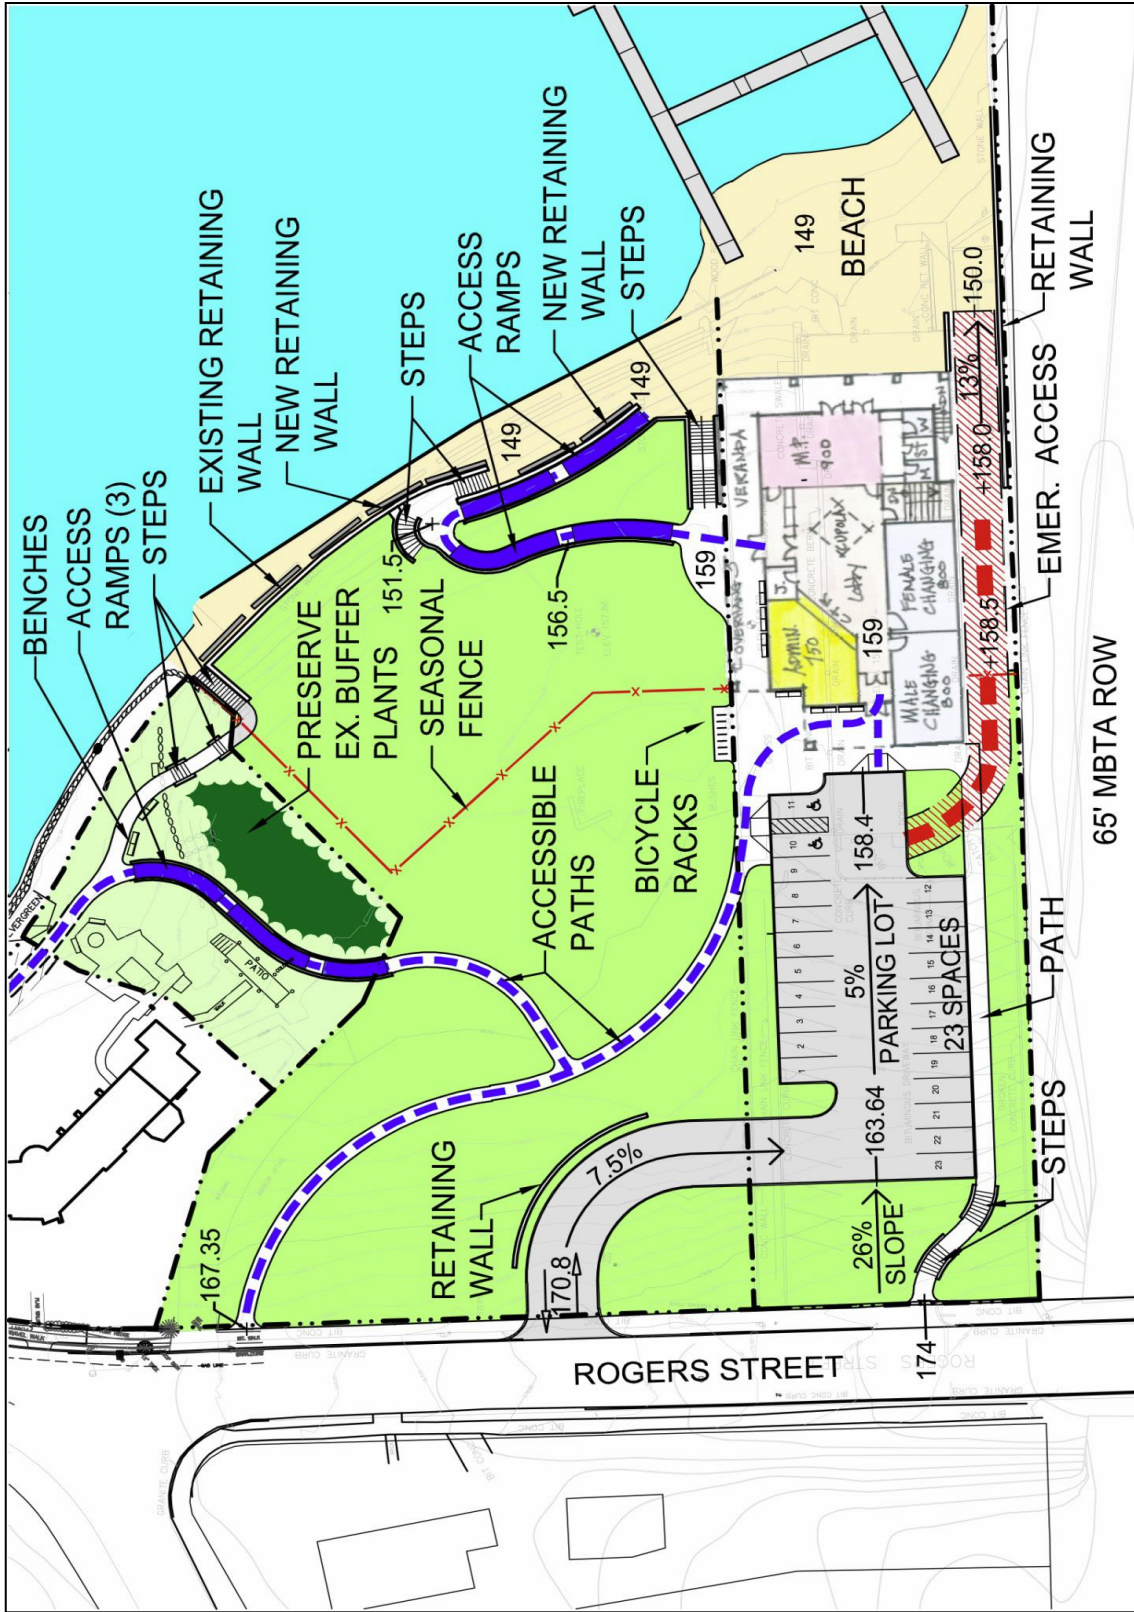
Site Layout of new bathhouse and adjoining park (parking lot replaced with Fig 4: Oval parking lot)
